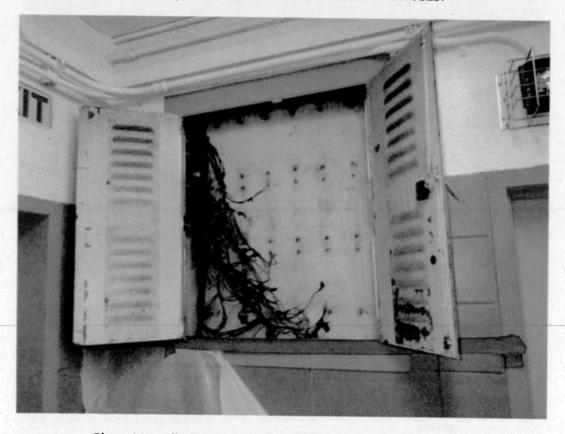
Ballast cabinet outside of Room 323 with doors open.
